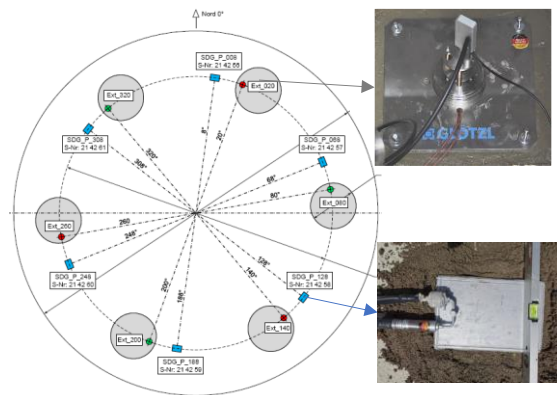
Top view of a fundament with the layout and example of extensometers and cell pressures.
